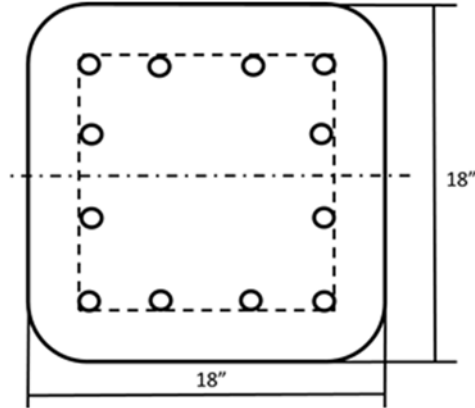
Standard Section for Prestressed 18'' x 18'' pile, adapted from TxDOT Bridge Division Specification.
